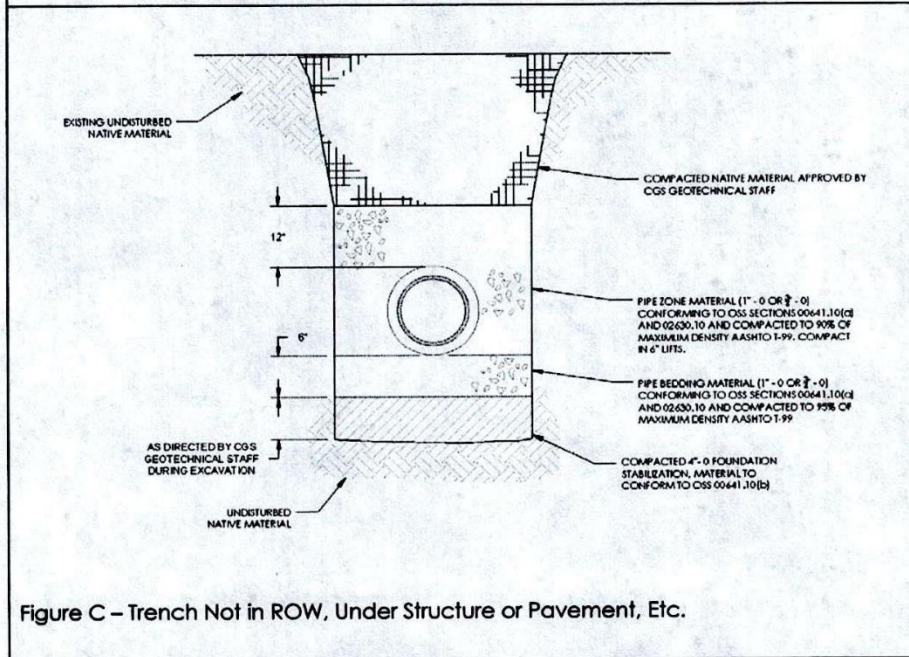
Figure C – Trench Not in ROW, Under Structure or Pavement, Etc.
